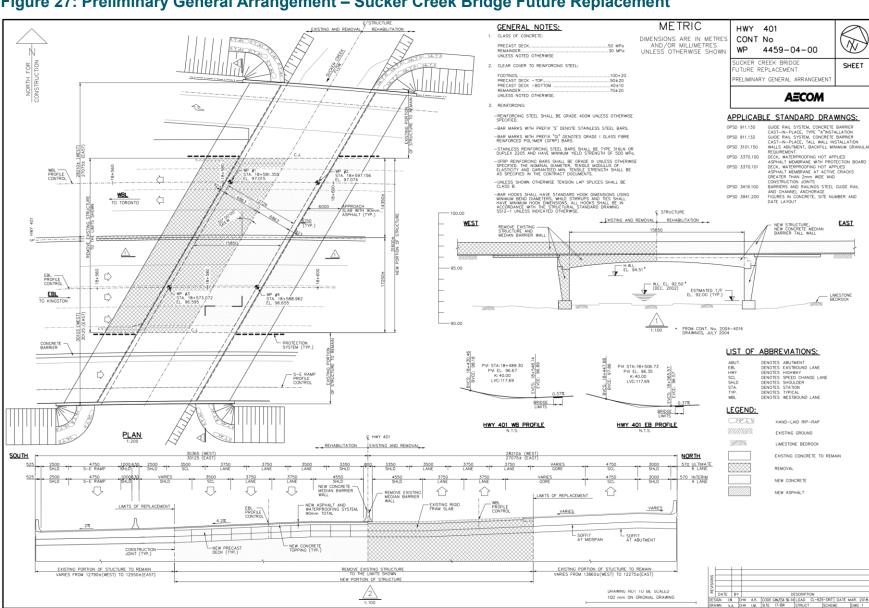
Preliminary General Arrangement - Sucker Creek Bridge Future Replacement
